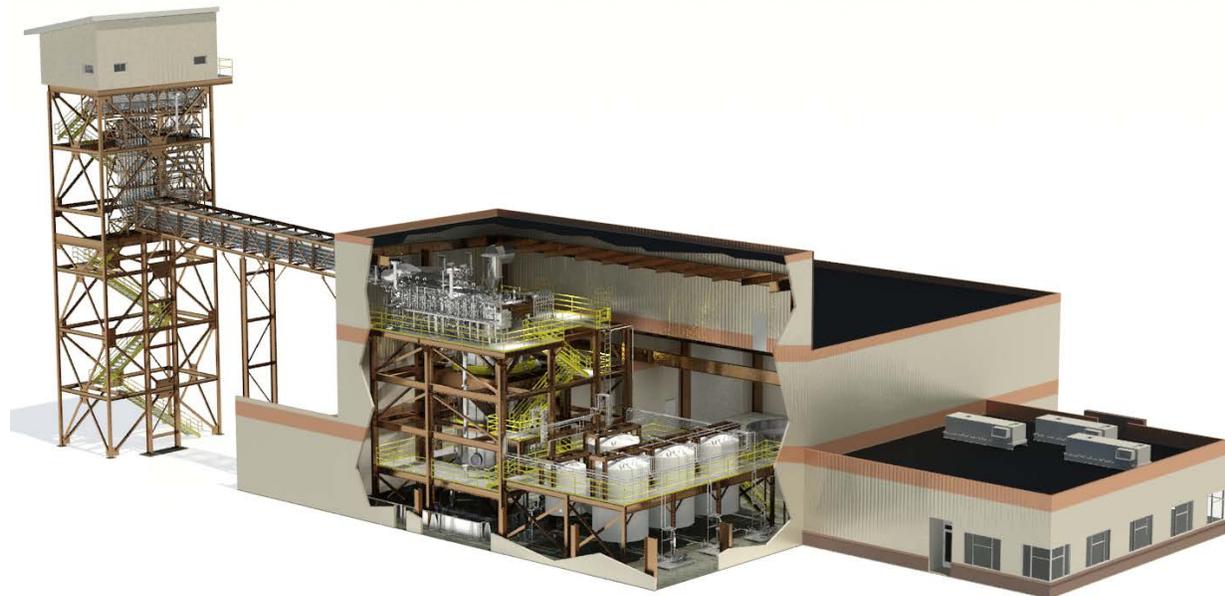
Washington State University Full-Scale Vessel Test Facility Rendering.
